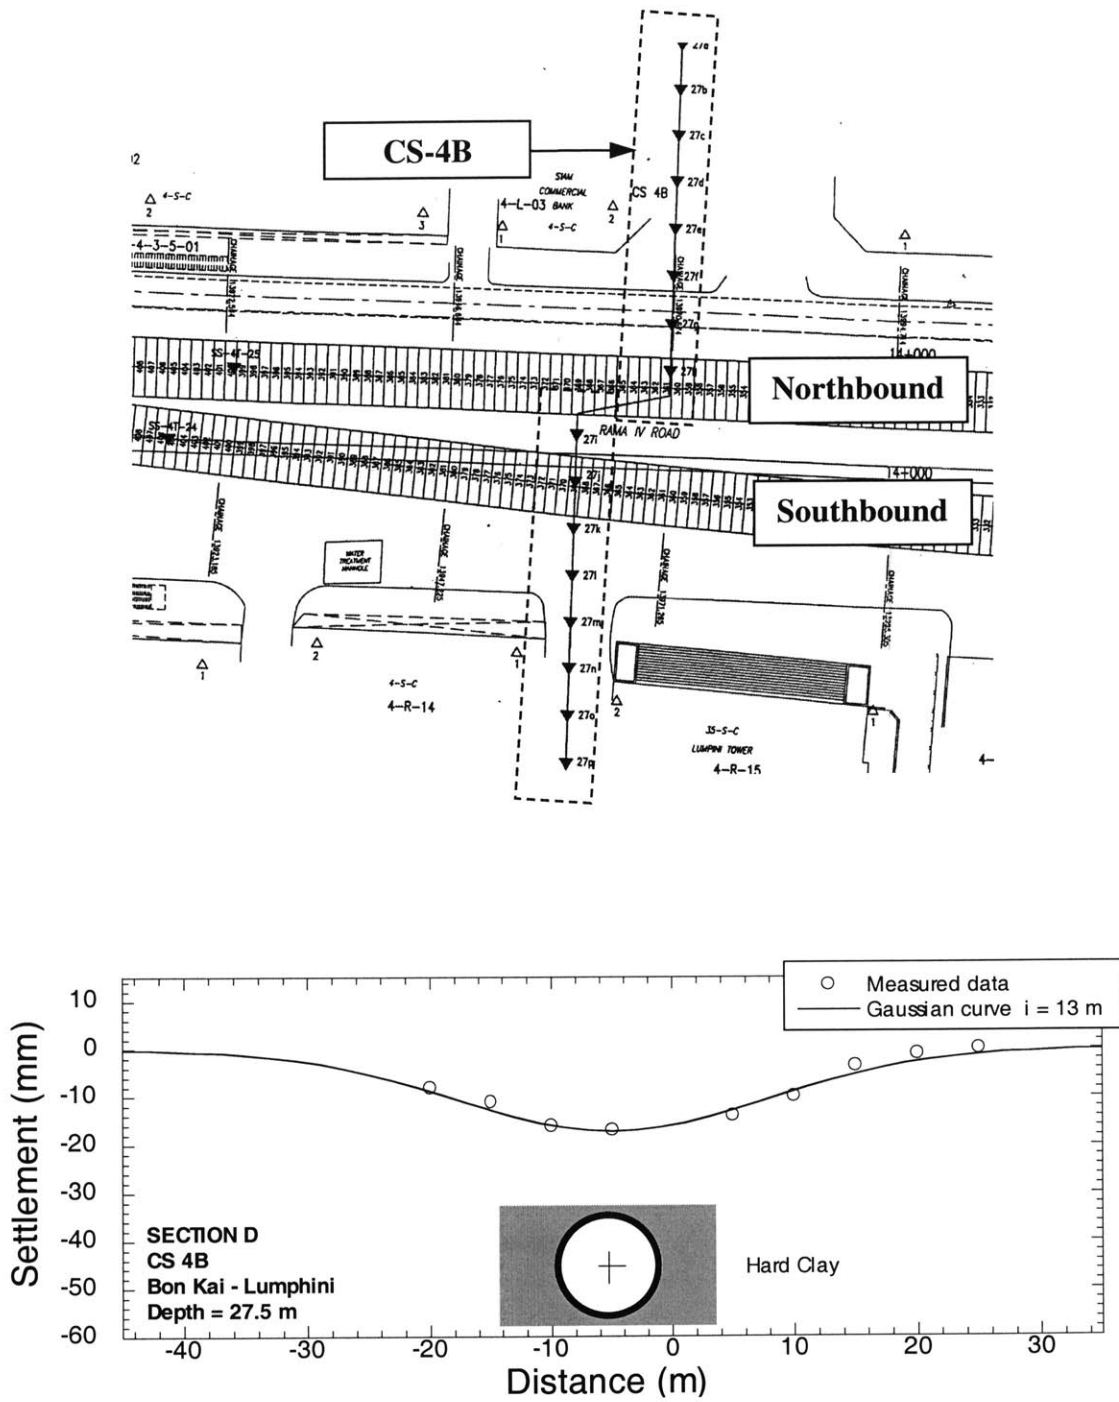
Surface settlement trough measured on CS-4B (southbound tunnel-Ring no.369) and the instrumentation layout
